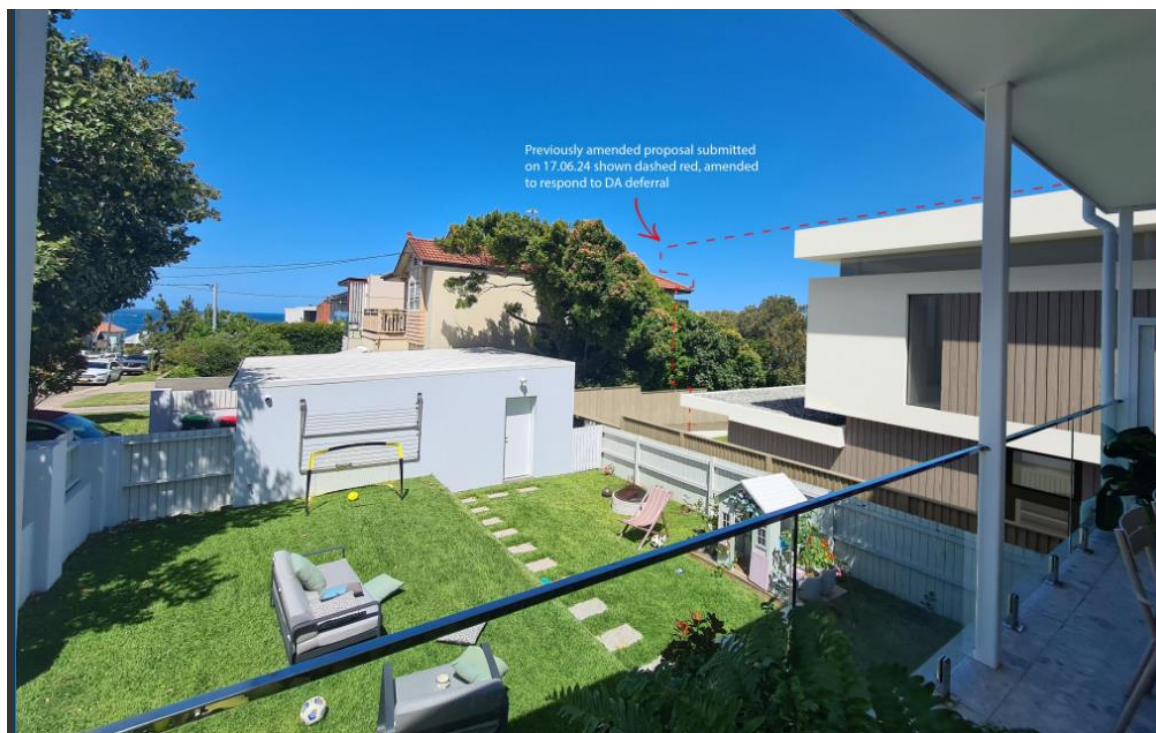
View from rear ground floor balcony of 1 Bona Vista Avenue - Render demonstrating how the proposal will look (Source: Applicant)
